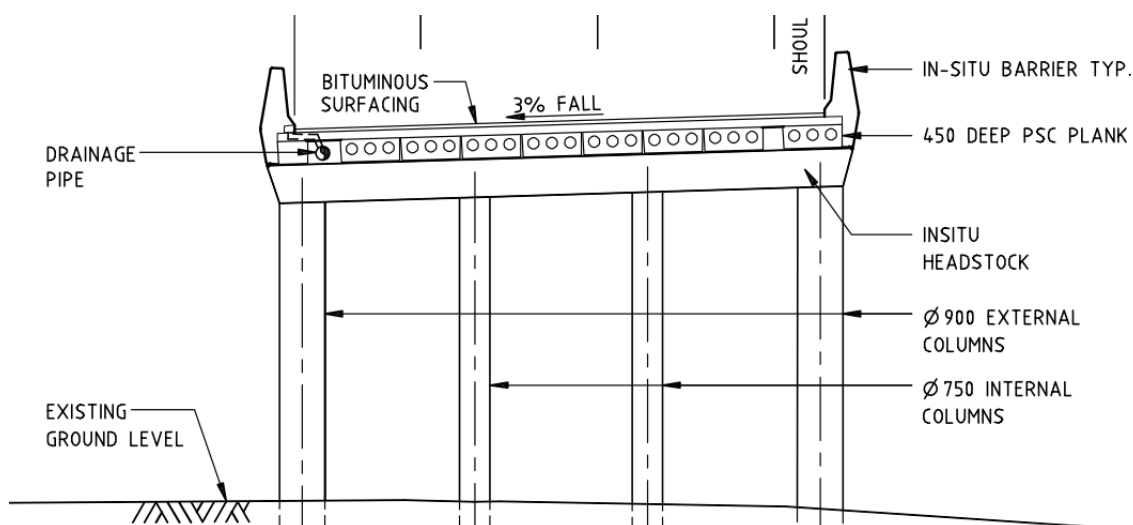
Typical Cross-Section at Pier – Existing Plank Bridges
